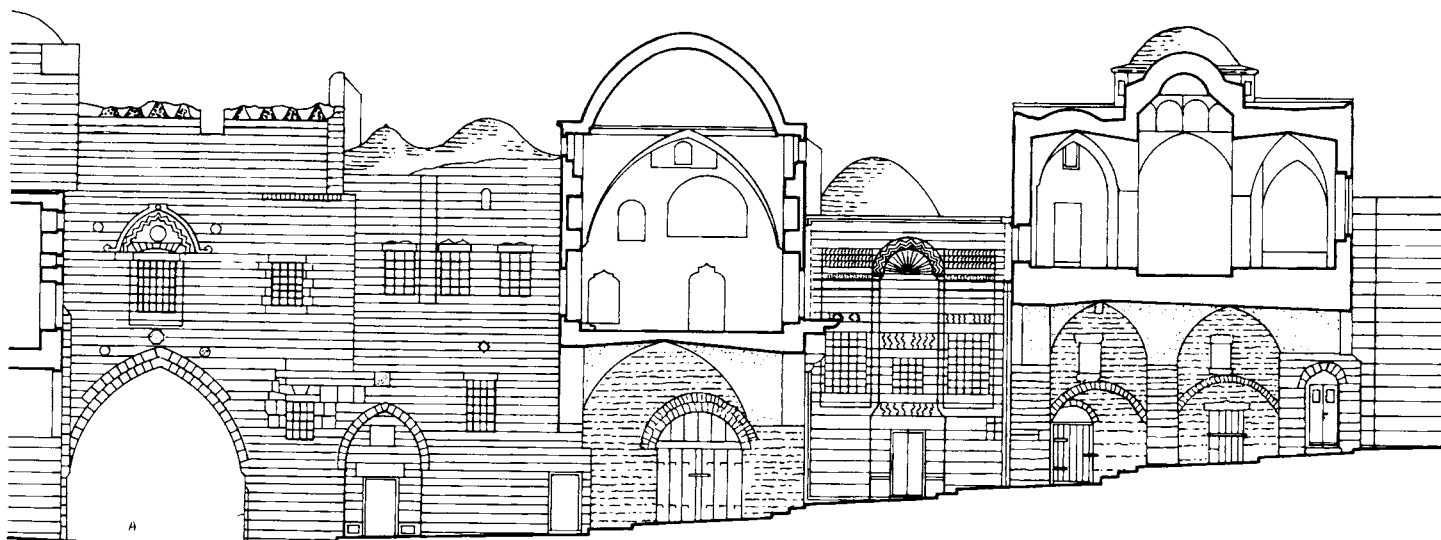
Ribat Bairam Jawish complex, façades and section.
